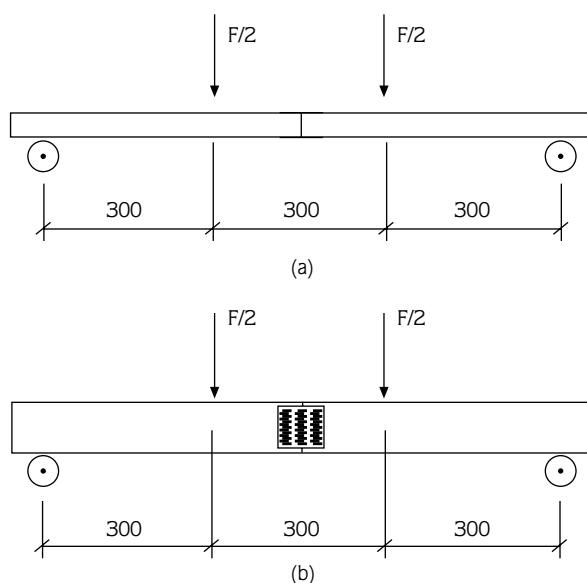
General configuration of loading: a) edgewise, b) flat (dimensions in mm).
